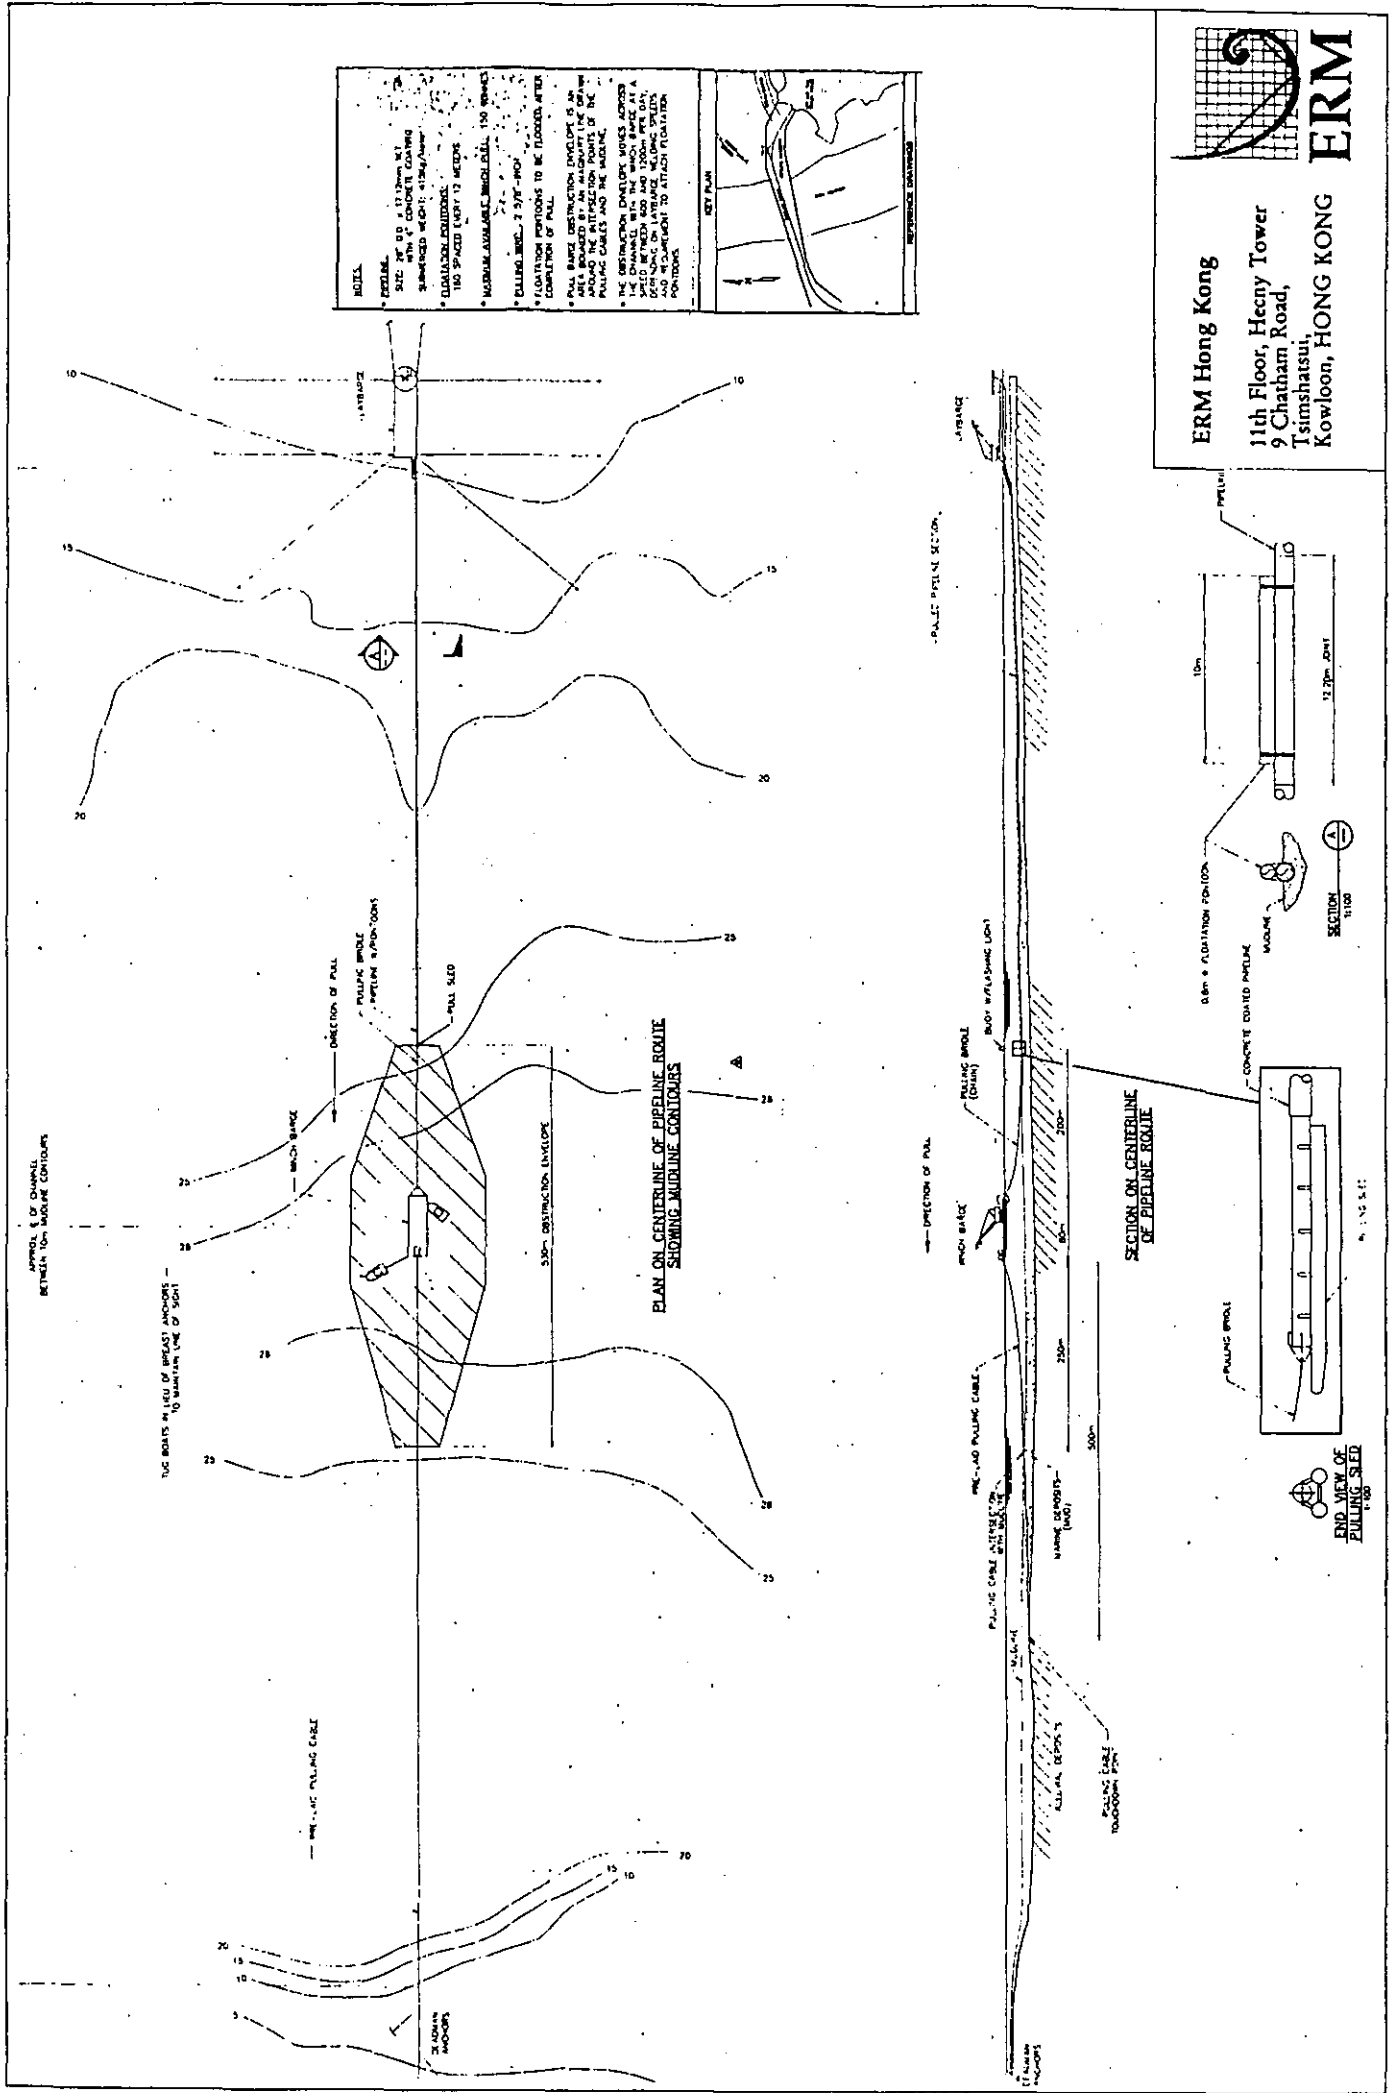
Urmston Road Channel Typical Pullbarge Obstruction Envelope Alternative 1
